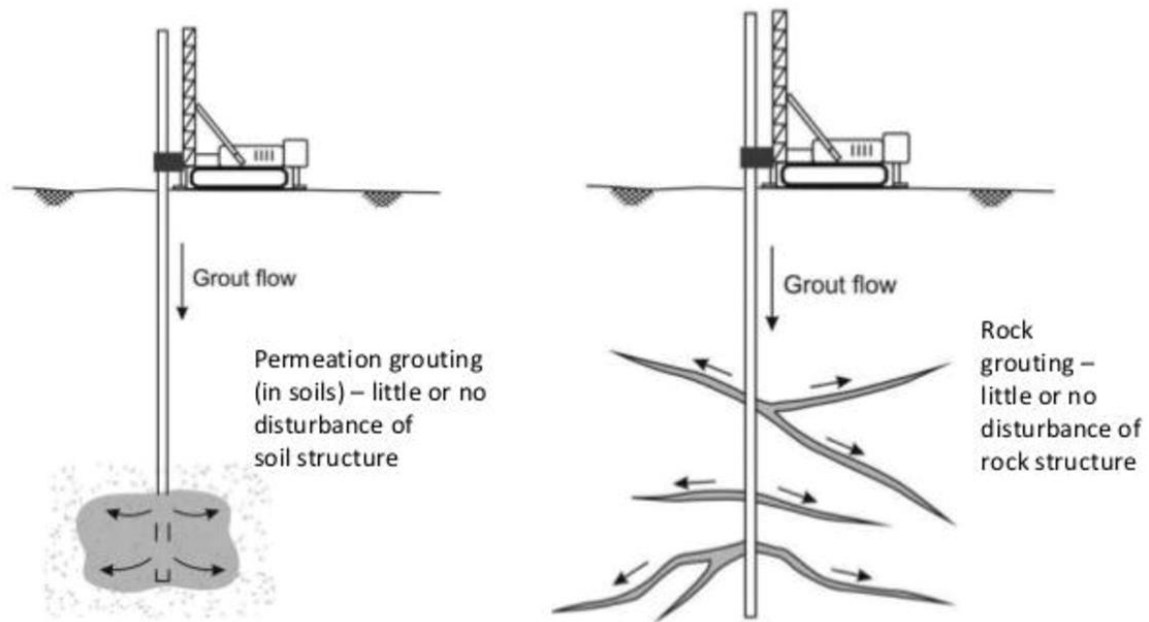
Permeation grouting in soil and rock (Rahman, 2016)
